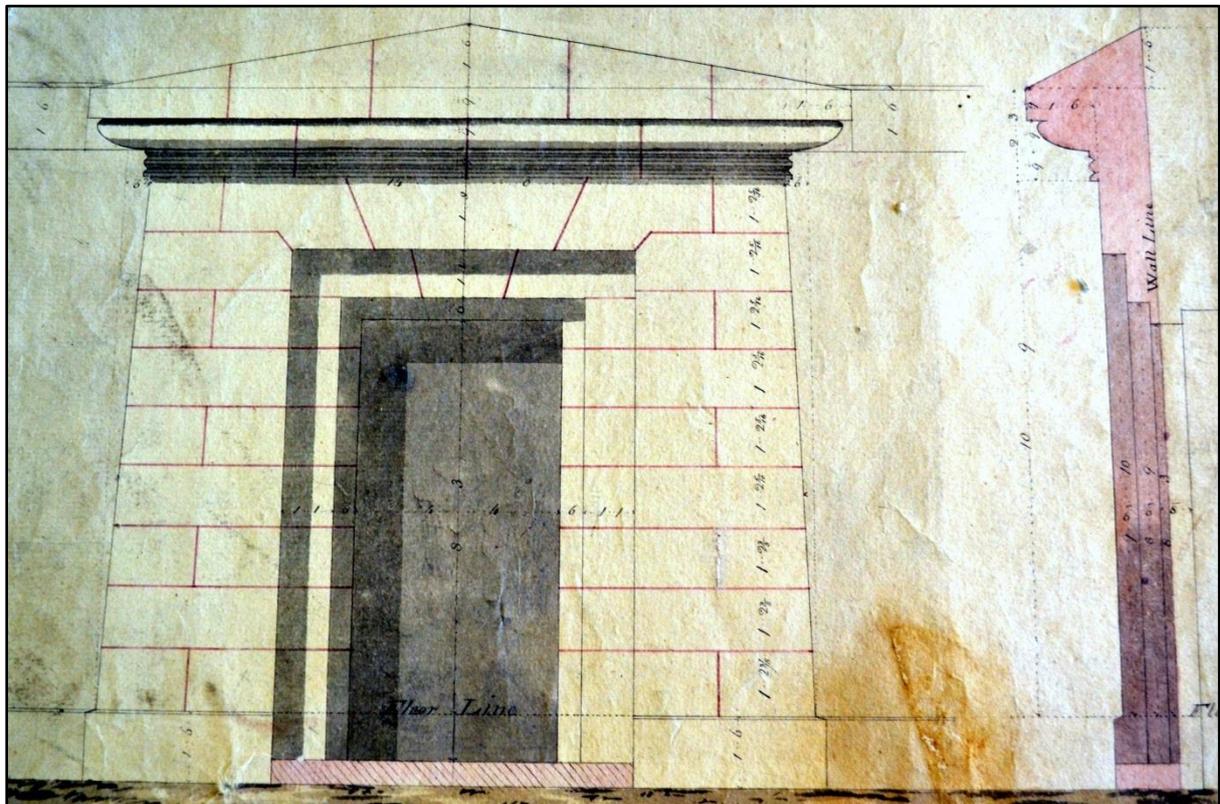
'Cease to Do Evil' doorway, Richmond bridewell, elevation and section. Johnston used a battered, Egyptian pylon-like composition, with an enormous overhanging cornice, to express
